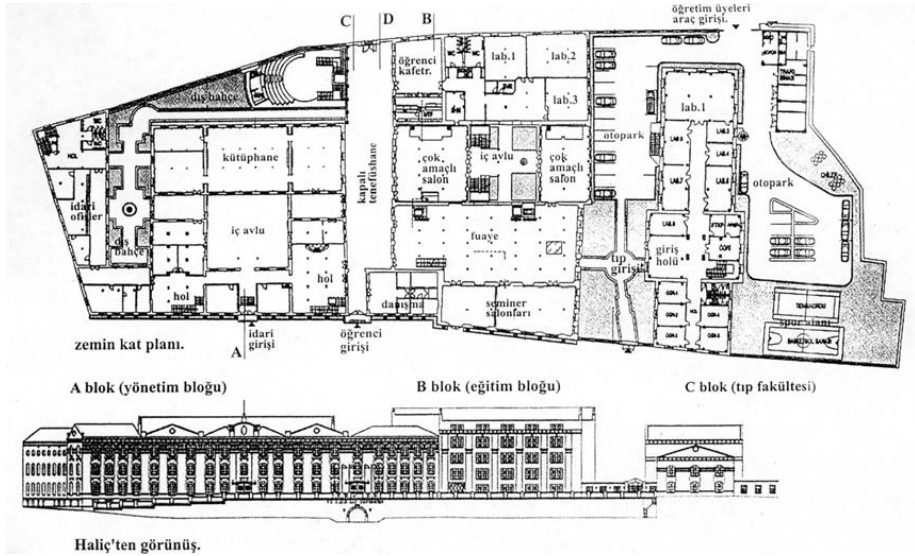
Ground floor plan and section after transformation to Kadir Has University (Erdoğan, 2002)
